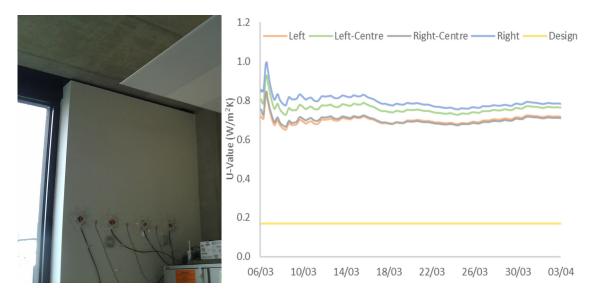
In-situ U-value measurements on a single north-facing section of the façade in the school building
